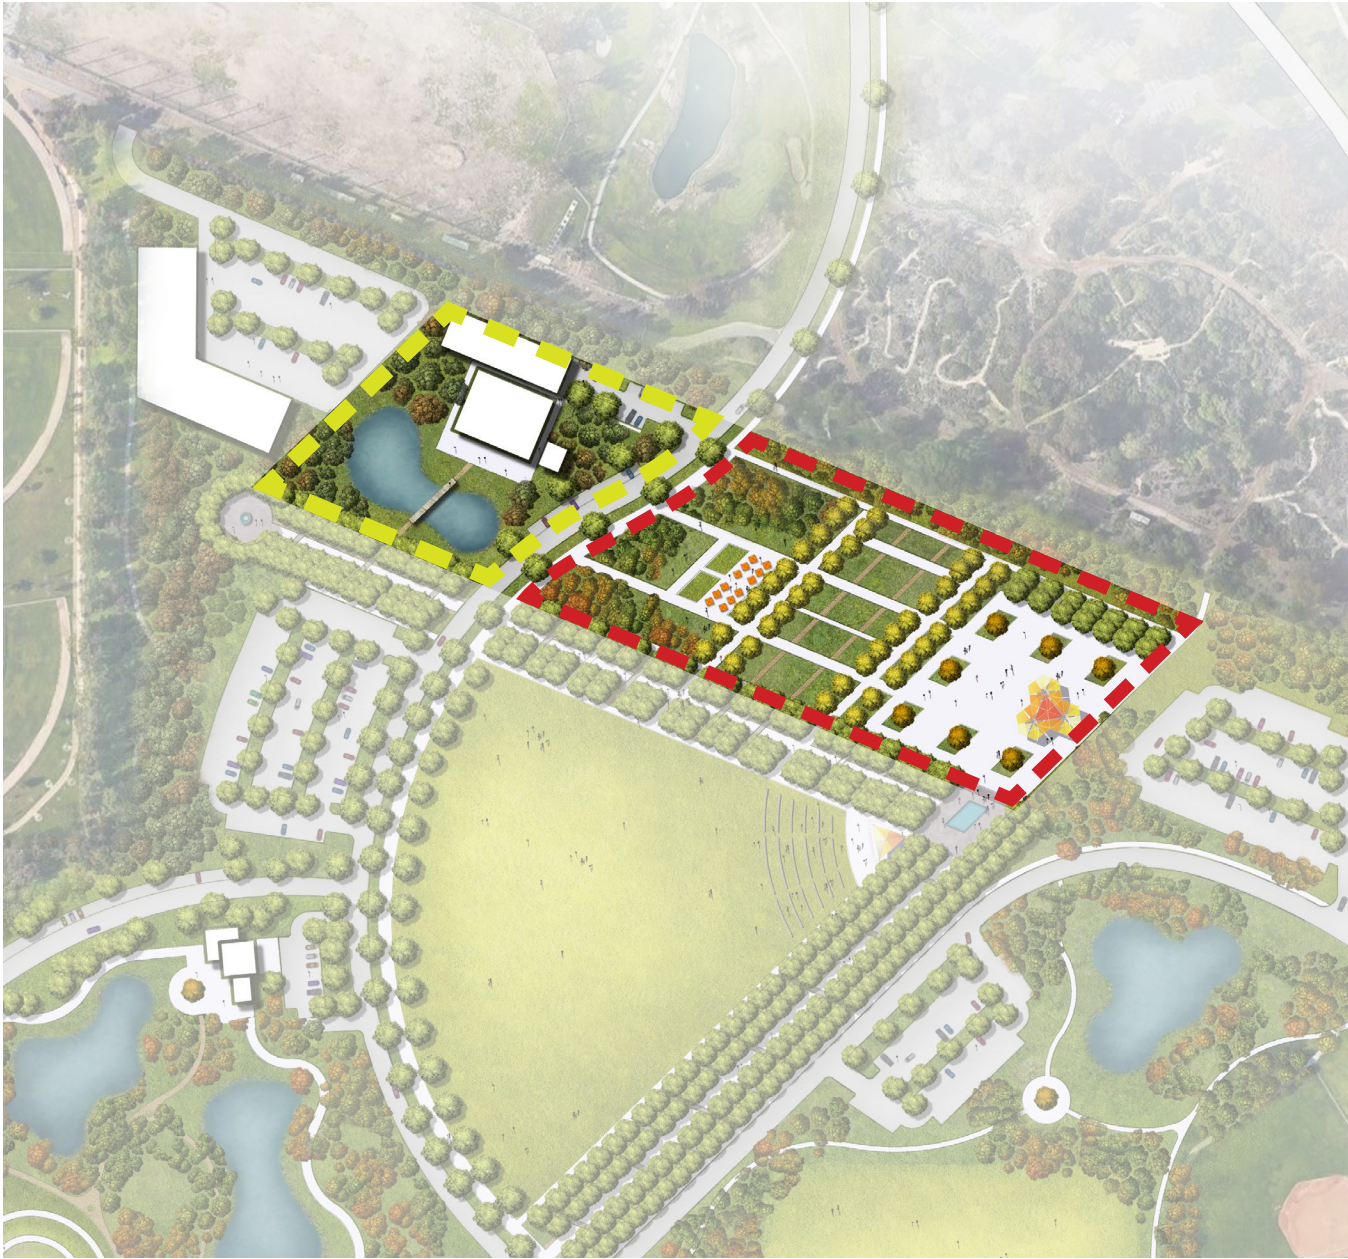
Civic Plaza and Visitor Center Enlargement Plan
